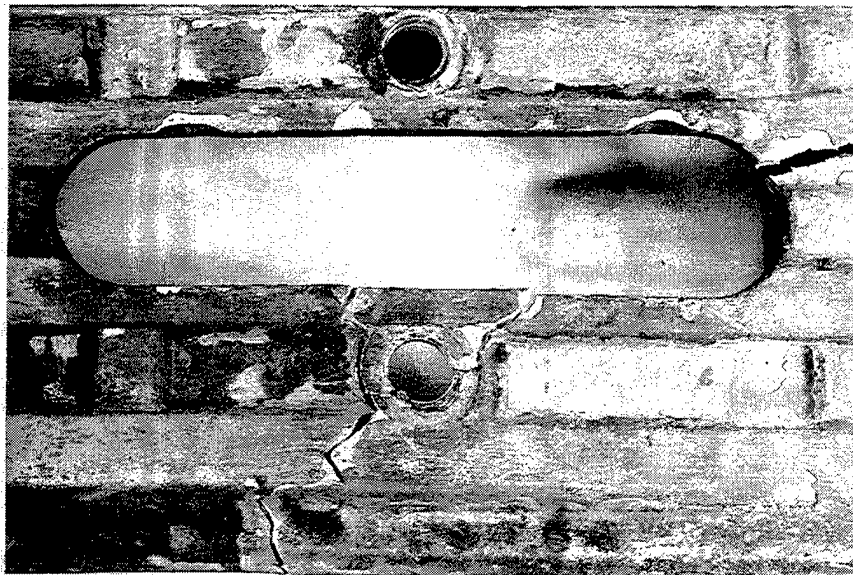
Close-up view of the damaged oblong hole in the deck panel in Figure 63 after the removal of the lifting bar, bolts, and steel ring. Although not clearly seen in the photograph, a small crack was observed in the upper bolt hole.
